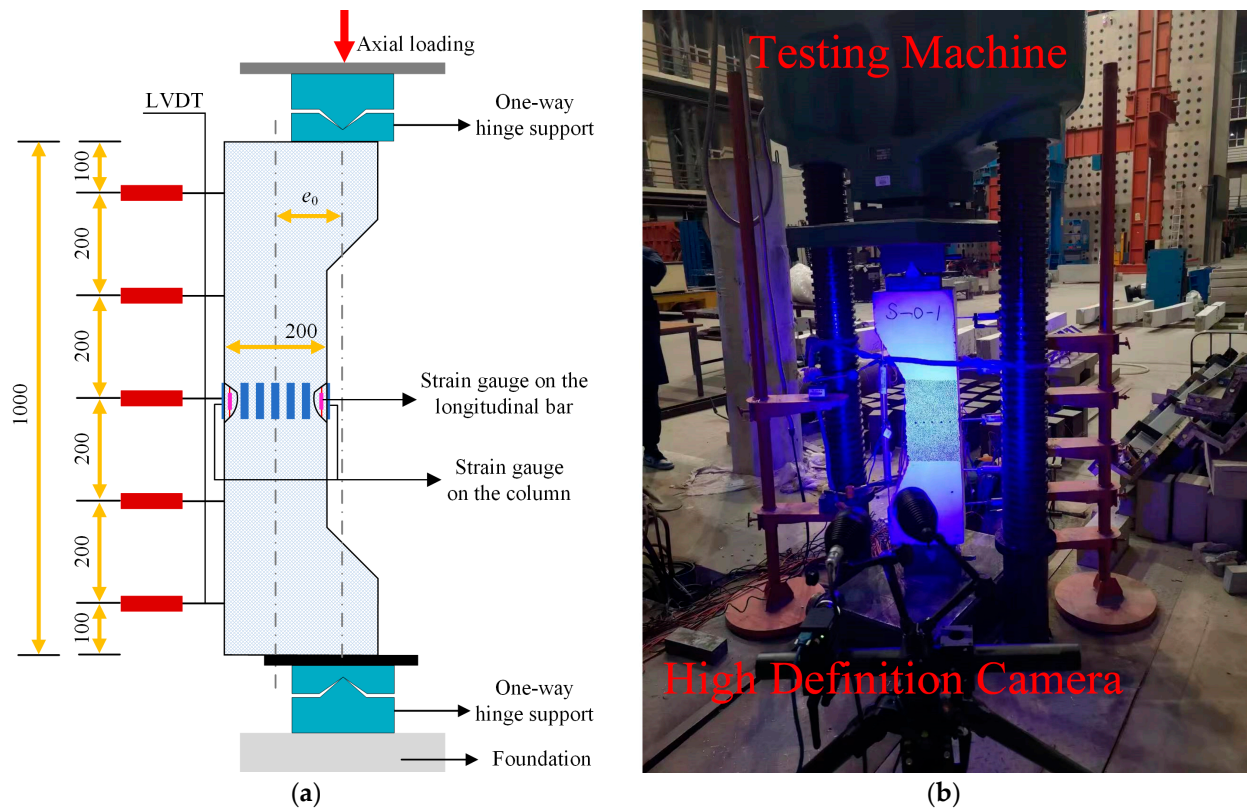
Test design: (a) measurement point layout, (b) DIC and testing machine.
